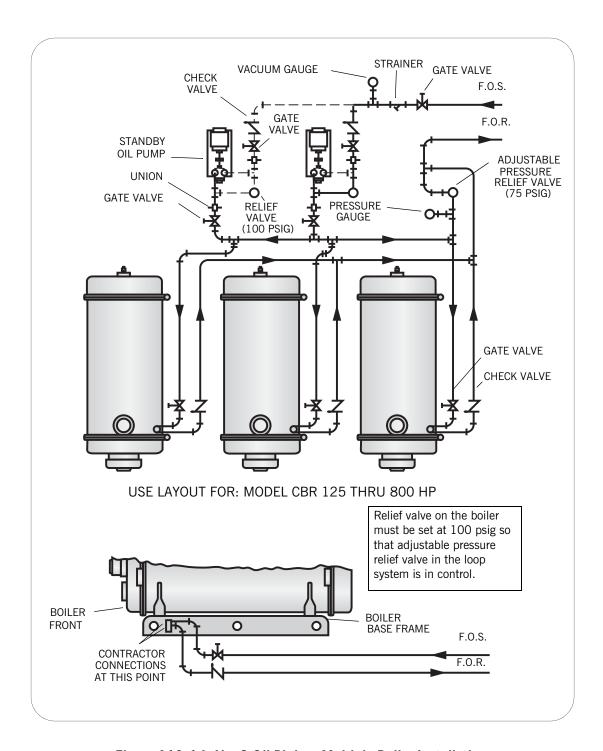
No. 2 Oil Piping, Multiple Boiler Installation
